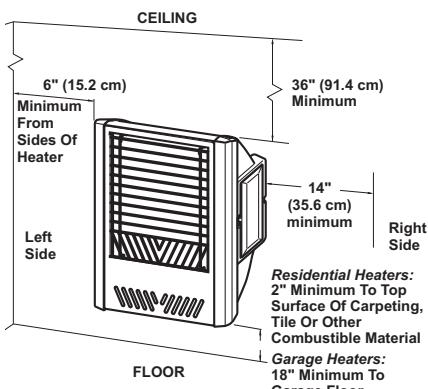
Mounting Clearances As Viewed From Front of Heater
